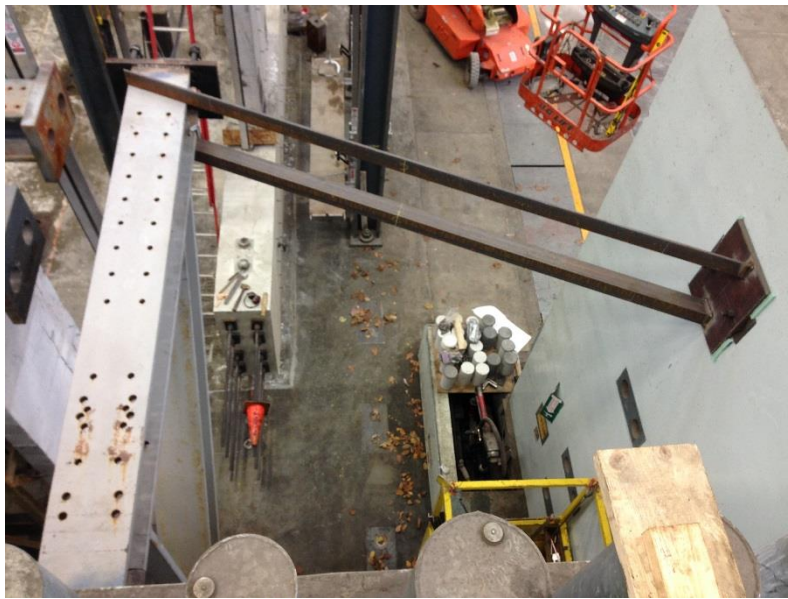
Steel bracket and steel angles used in the setup of Wall 2 and Wall 3
